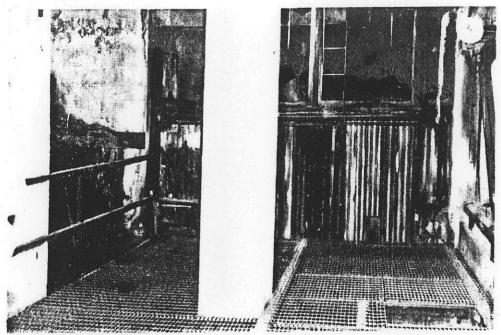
Concrete Column and Steel Flooring in Good Condition.
